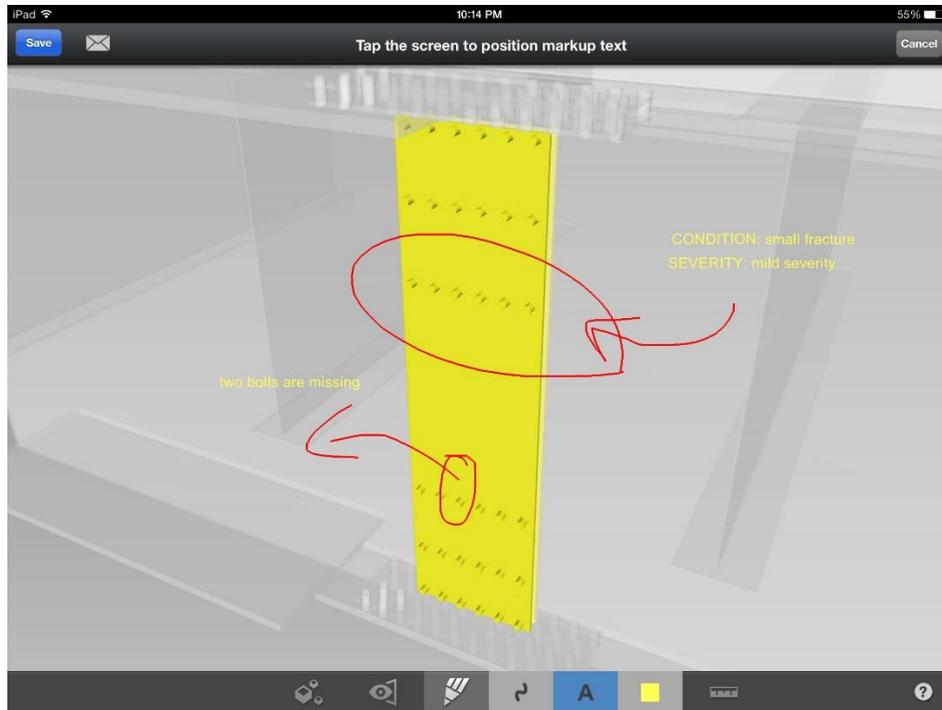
Drawing sketches and entering notes in BIM 360 Glue
